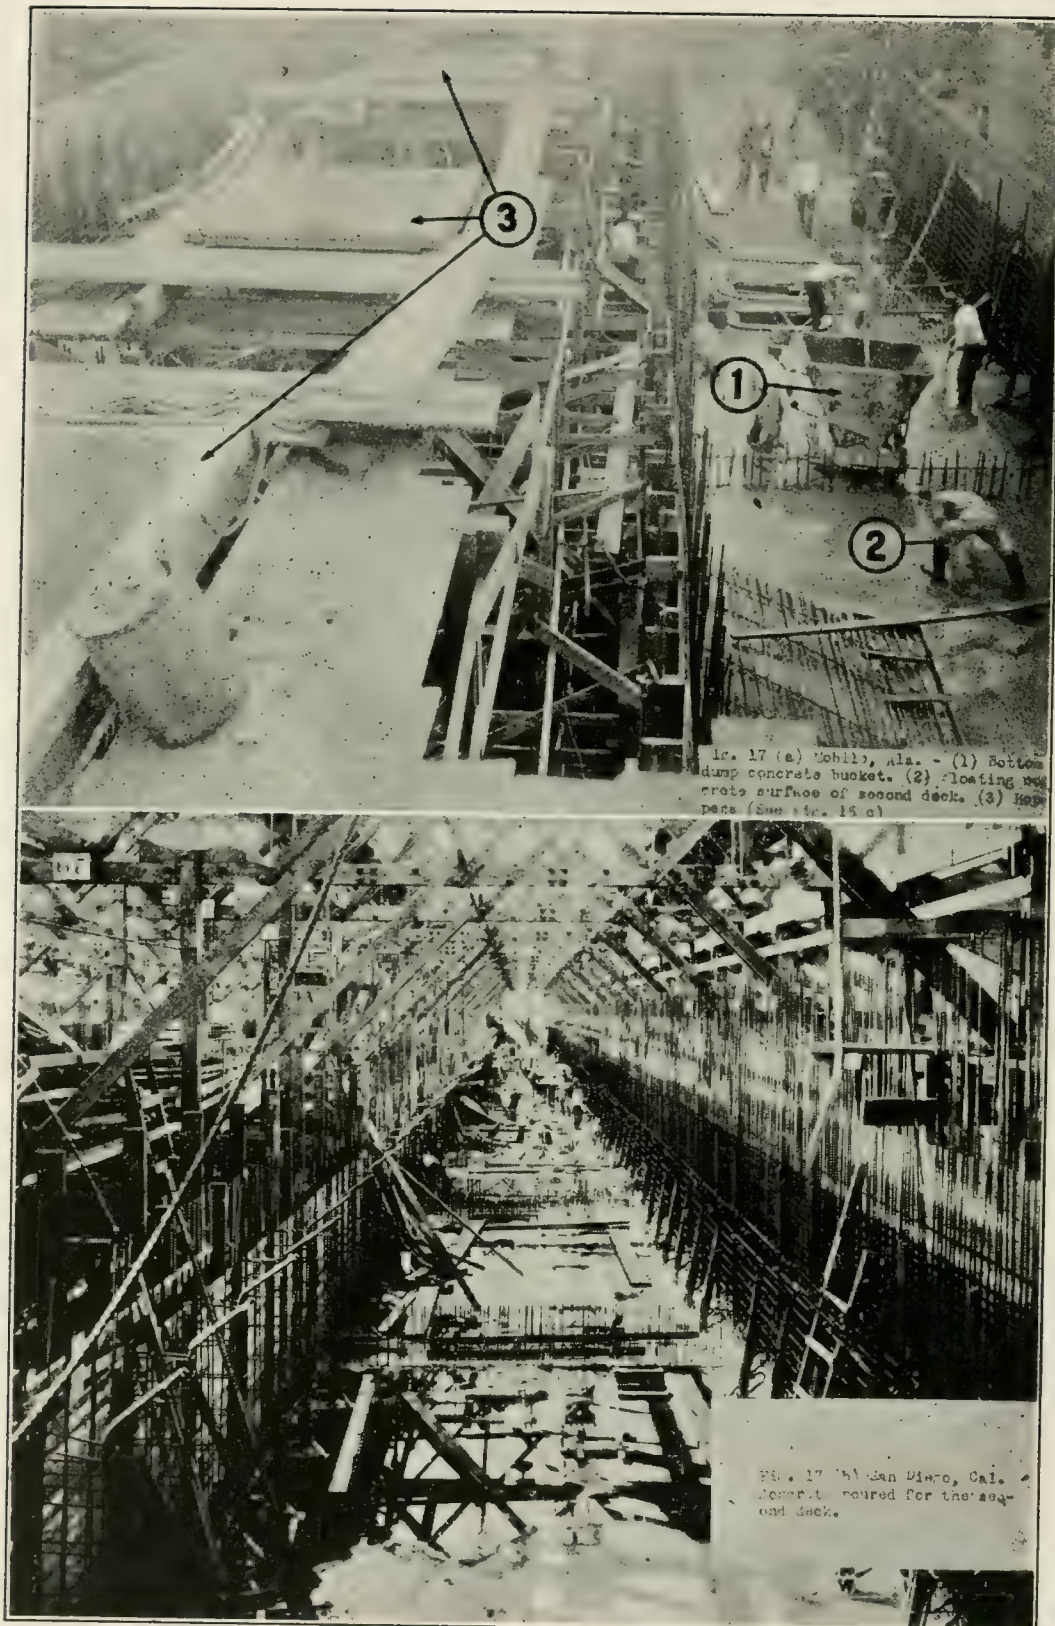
CONCRETE PLACED IN THE SLAB AND BEAMS OF THE SECOND DECK.
